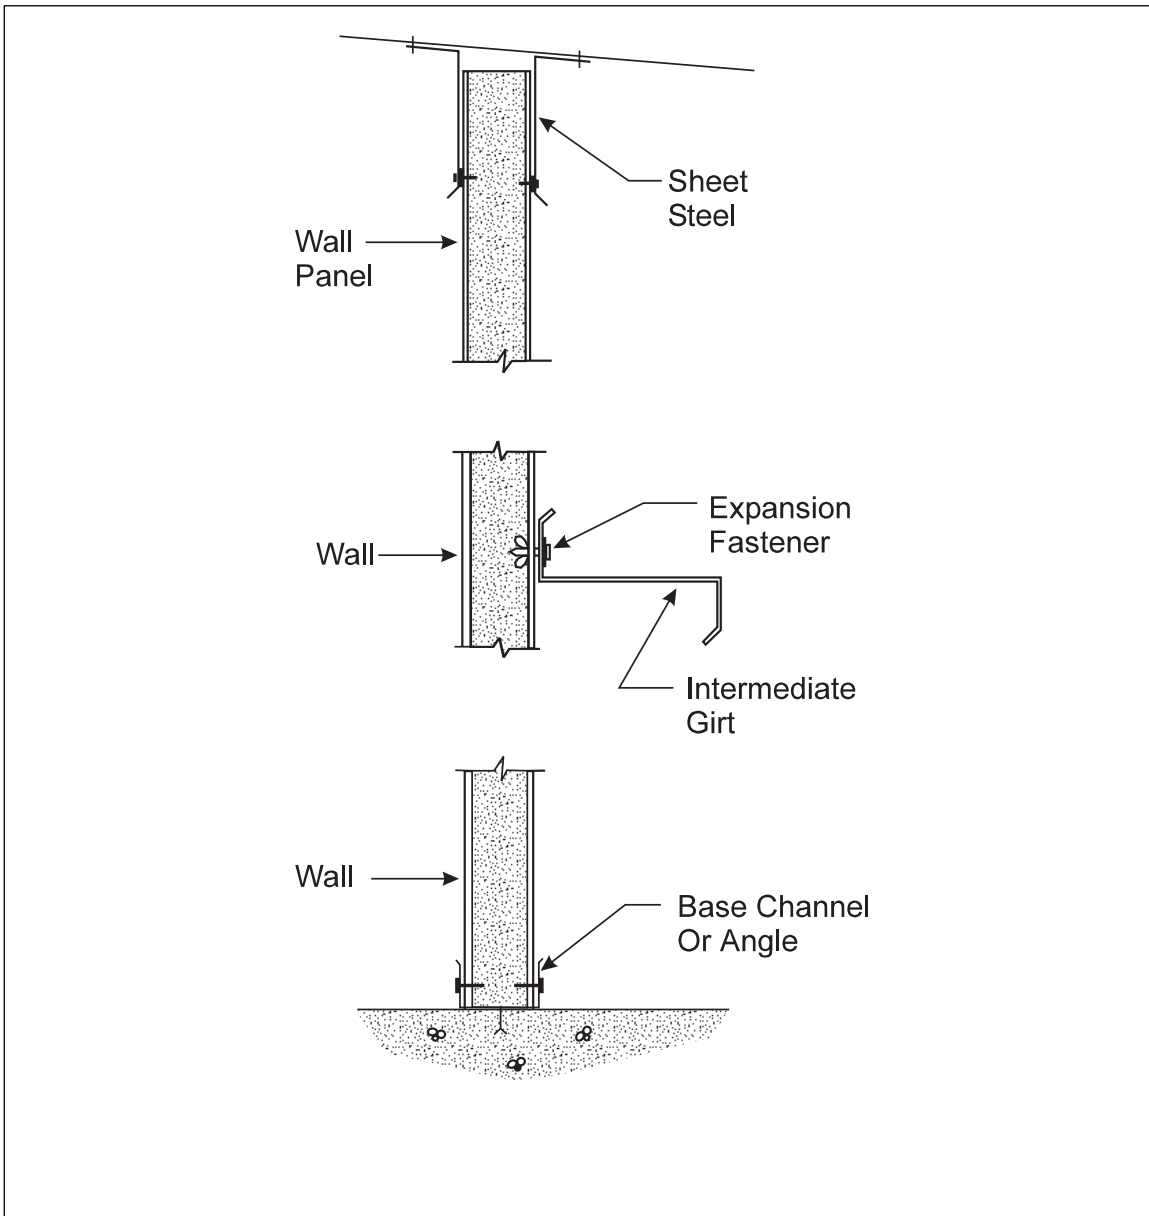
Wall panel with channel securement at the top and bottom
